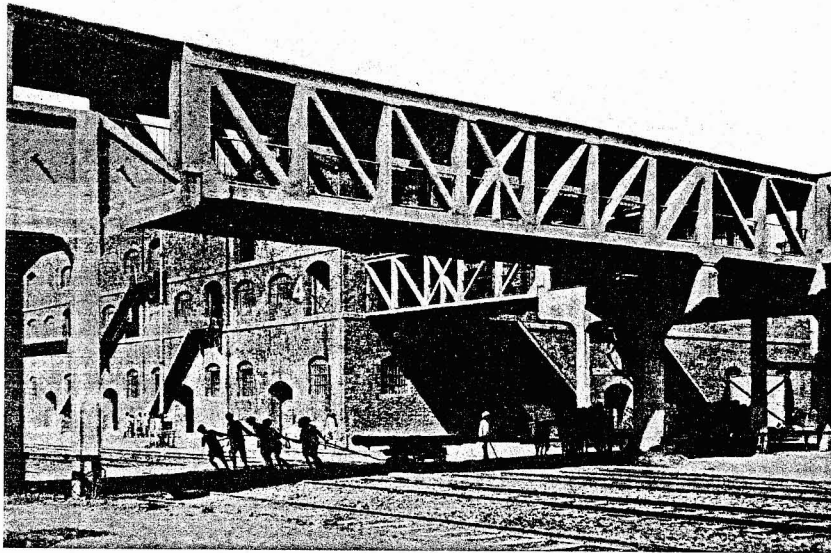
Reinforced concrete over-bridges at the New Alexandra Docks, Bombay (from *Concrete and Constructional Engineering*, May 1917).
